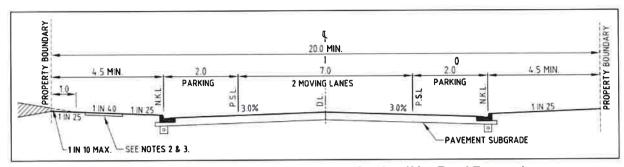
Approved Internal Road Cross-Section (20m Road Reserve)
